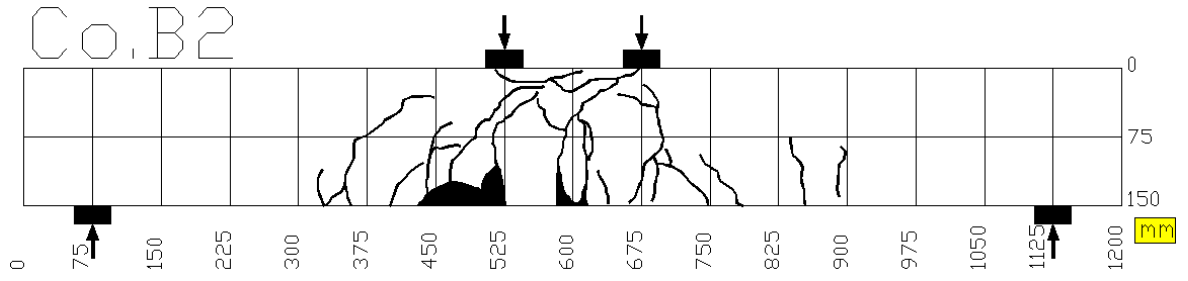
Crack Pattern for Beam (Co.B2) At Failure
